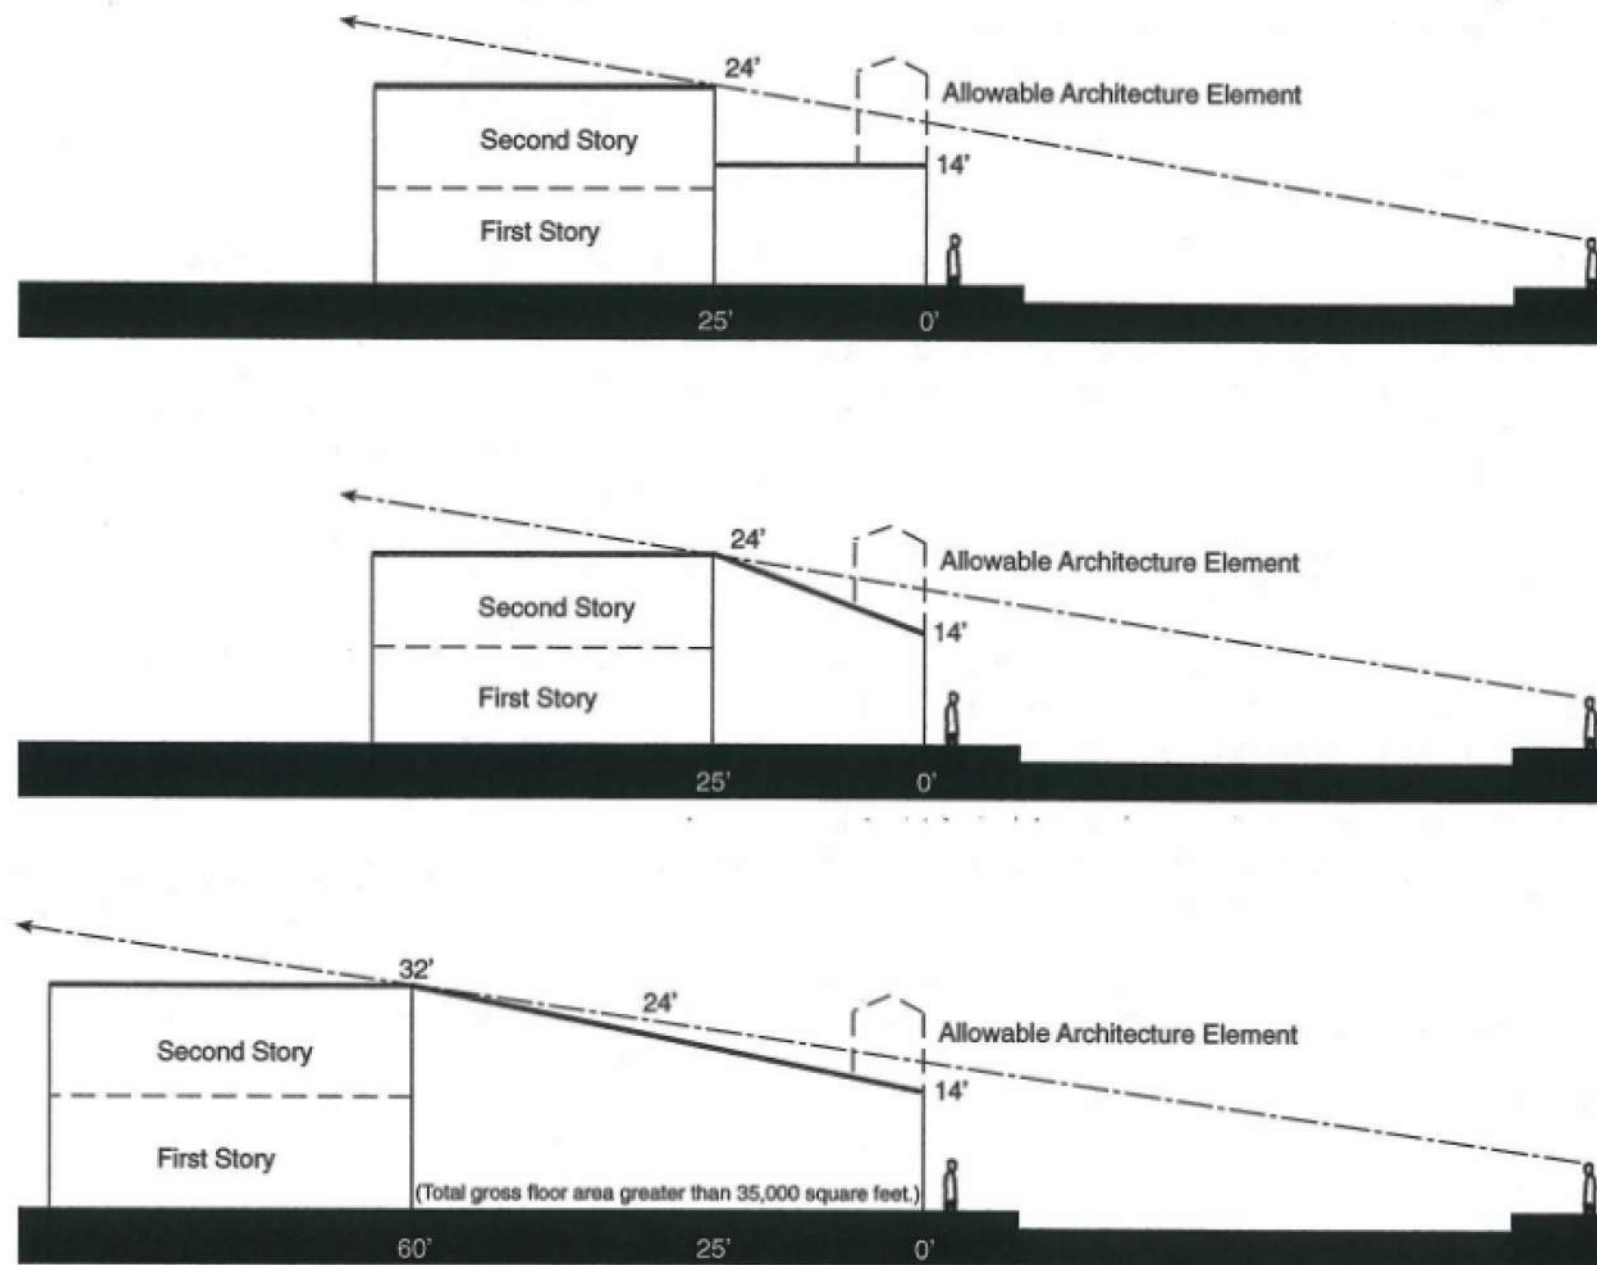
illustrates the front façade height requirements set forth in Section 7.2.3.1.
